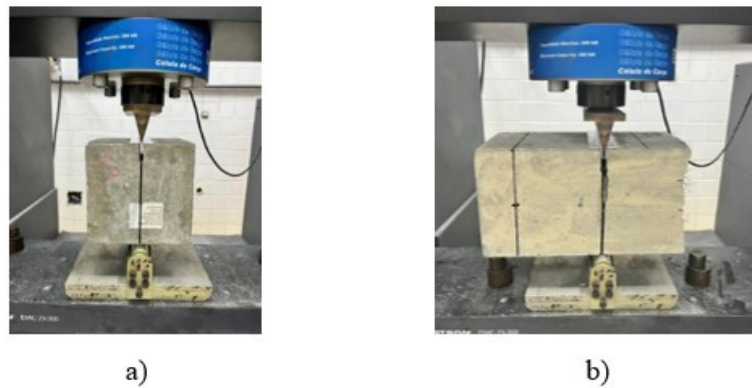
MVD test: a) Cubic specimen; b) Half of the beam.
